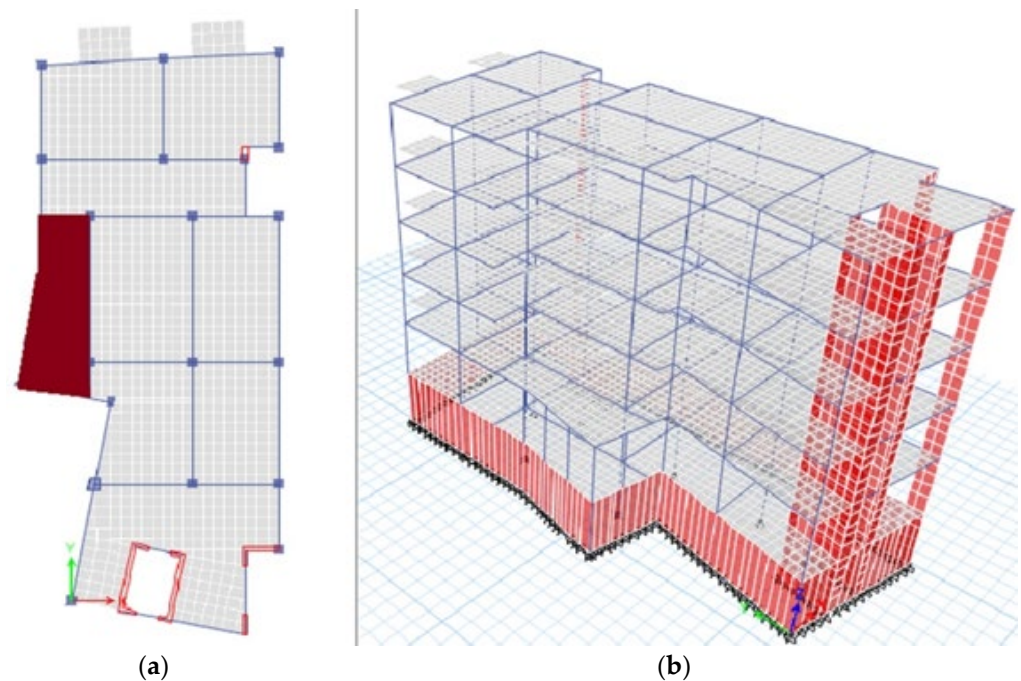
ETABS structural model [29,30]: (a) ground floor plan layout; (b) 3D-view.
